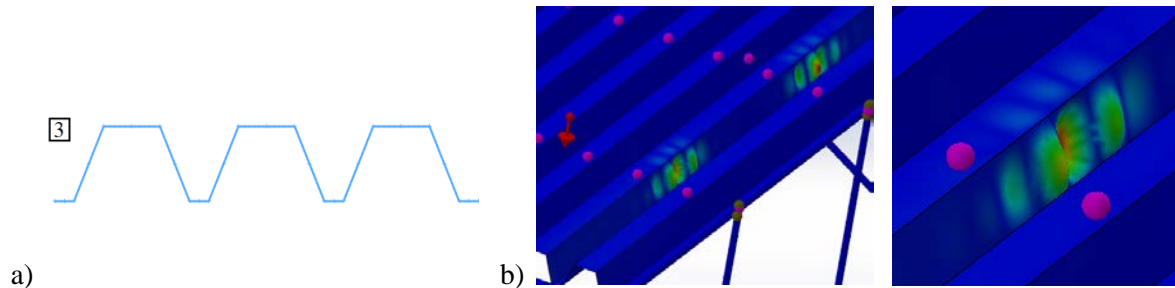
Trapezoidal sheeting of the roof a) cross-section view and b) the first mode of local buckling.
